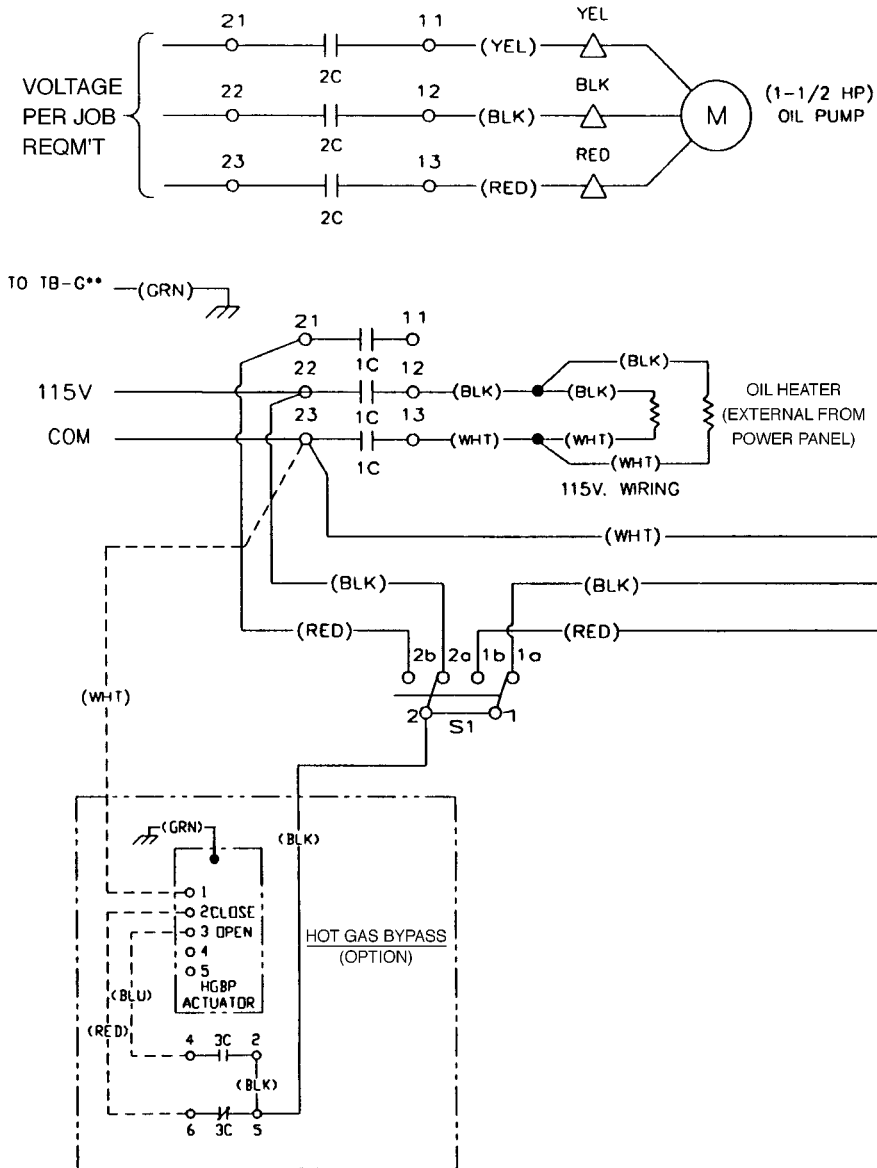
Hot Gas Bypass Valve Wiring Schematic (Frame 5 Compressor)
